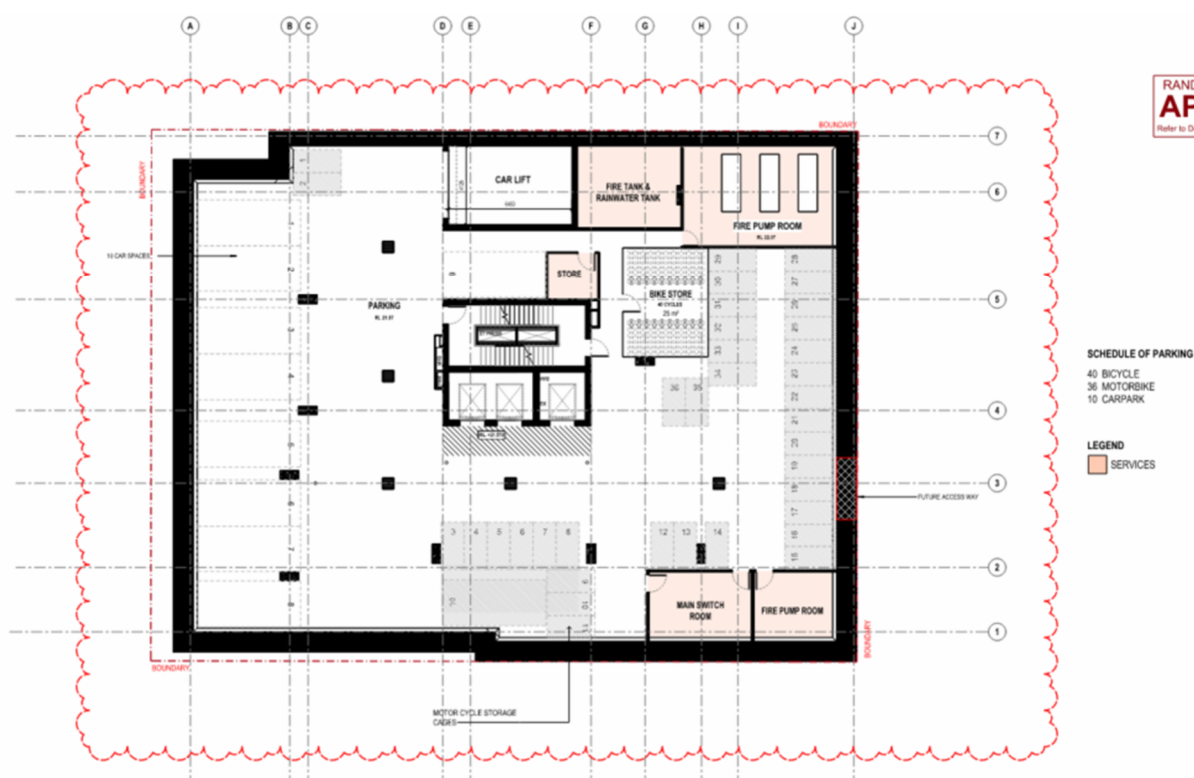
Approved Basement Floor Plan (Source: DA/414/2020/B)
